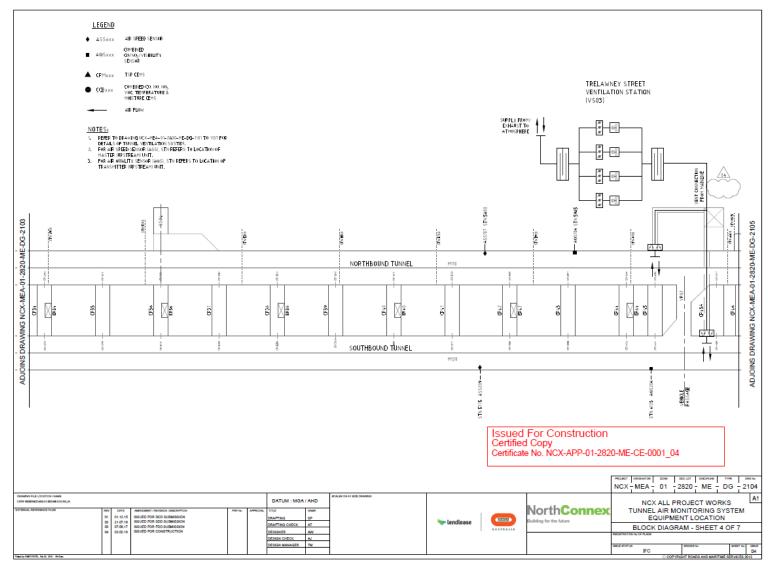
In-tunnel air monitoring locations – Sheet 4 (AQS106, AQS206)
